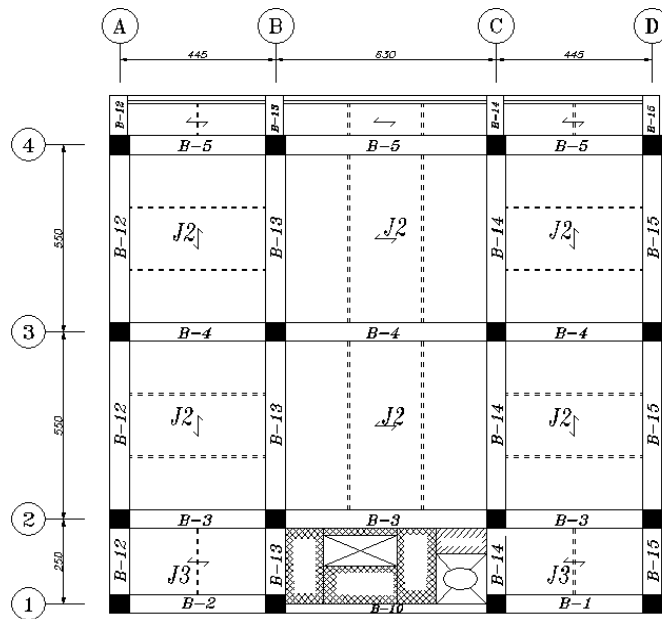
The plan to specify beam and floor type for elevations 6.20, 9.60, 13.00, 16.40, 19.60 and 23.20
